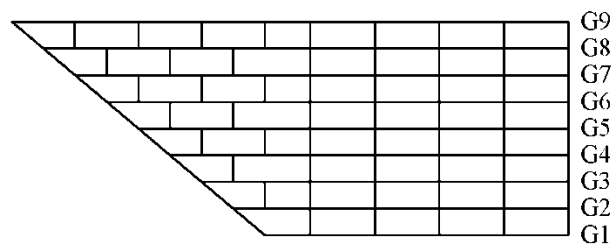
Framing plan of NISSS16 with the cross-frames oriented perpendicular to the longitudinal axis of the girders (Layout 1)
